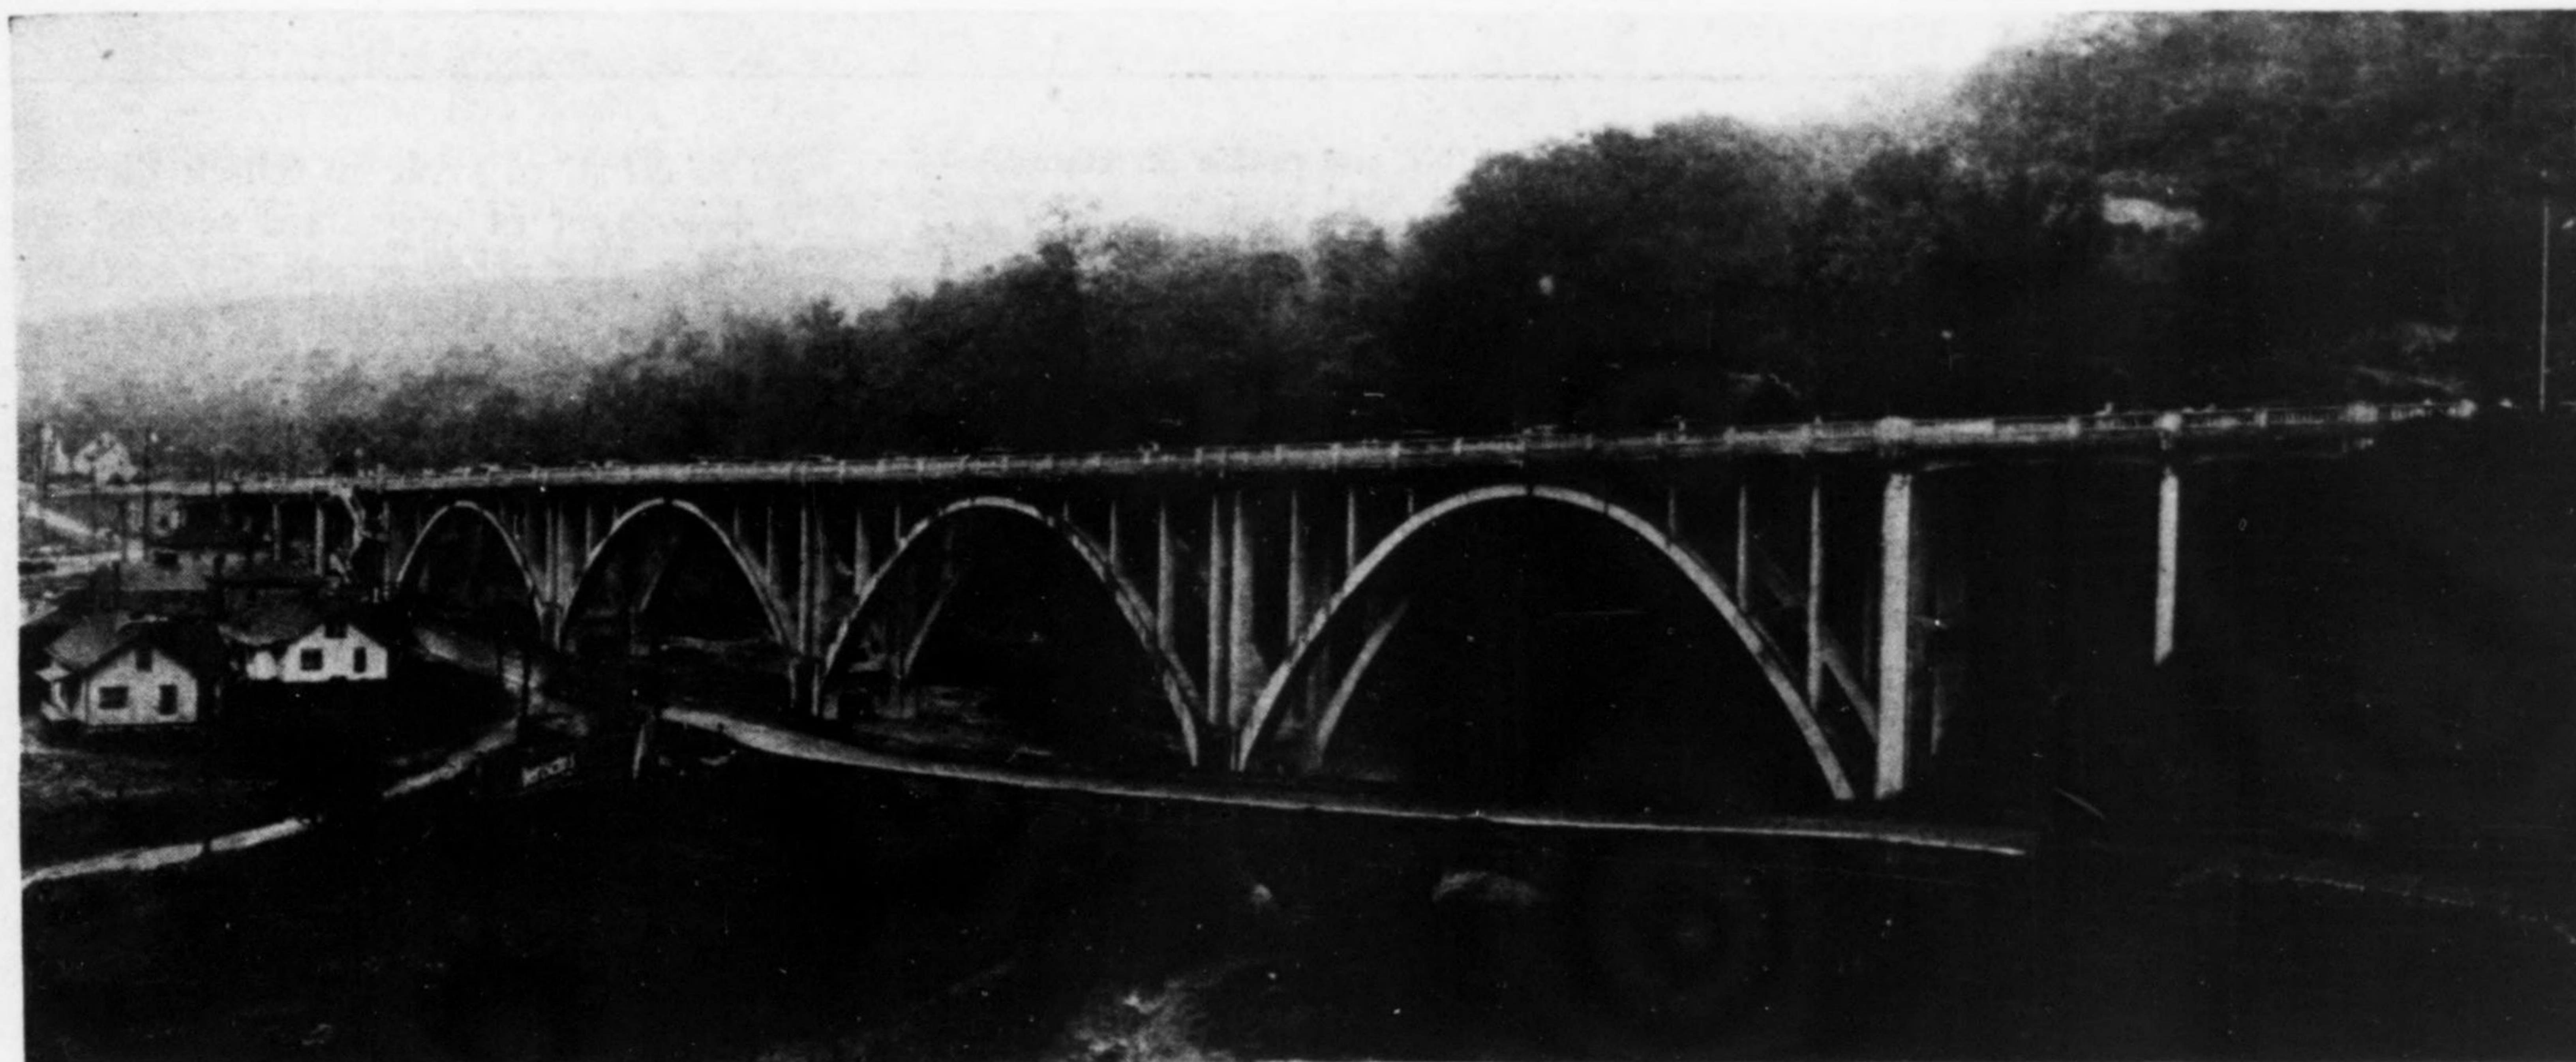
RELOCATION of old National Road near St. Clairsville, Ohio, showing new high-level viaduct over stream and railway and stone arch of old road constructed in 1826.
